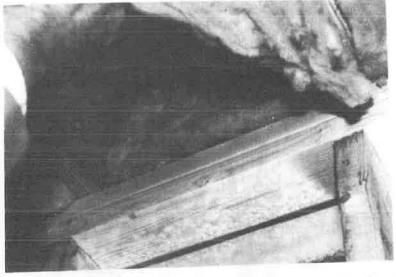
Metal back-up clips are used instead of an extra floor joist, to support edges of ceiling gypsum boards.
